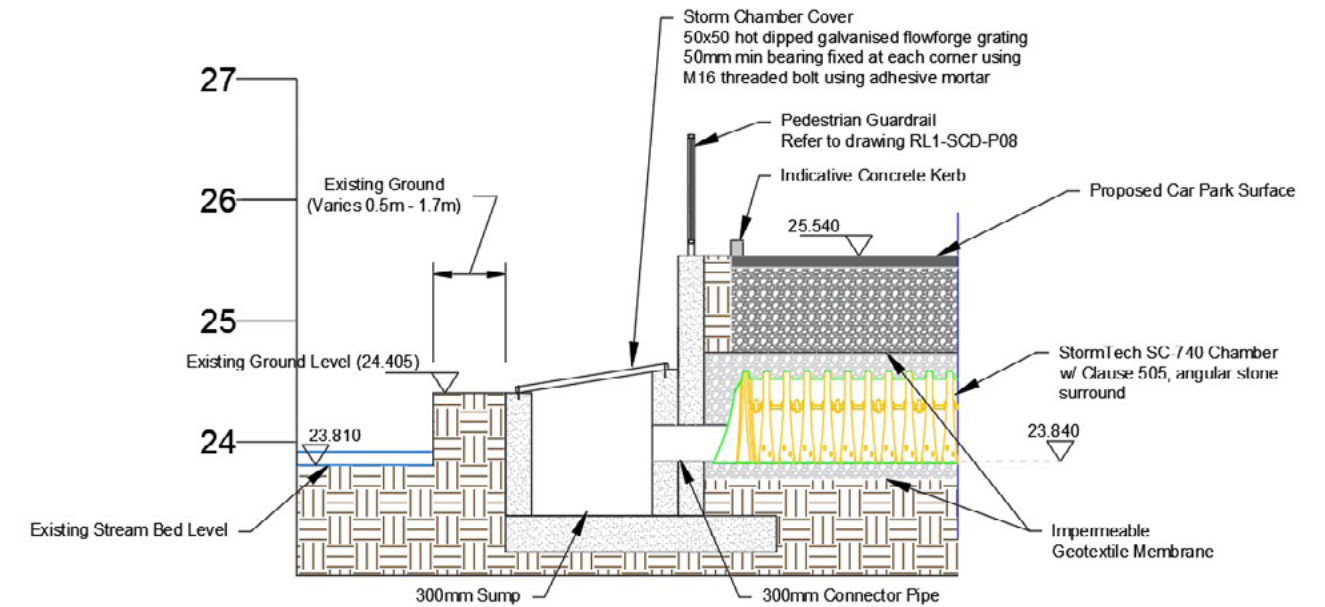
Cross-section of proposed flood storage with flood water receiving chamber
